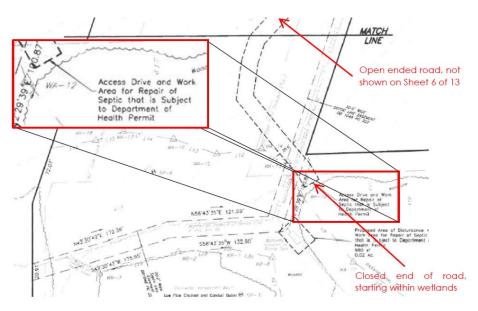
Screen capture of NW corner of Sheet 7 of 13, highlighting the NEW access road and its label. Note that the
